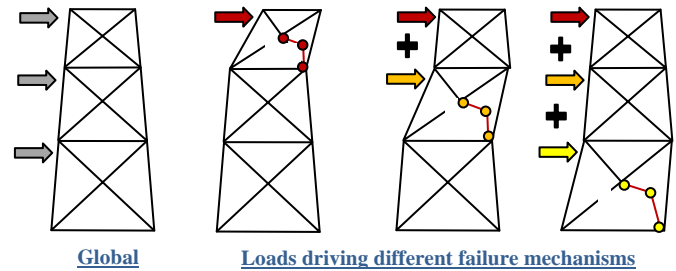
Space frame jacket failure mechanisms. Subsets of global loads driving different failure mechanisms. Only typical bracing failure modes shown. Same principle applies to leg failure modes.
